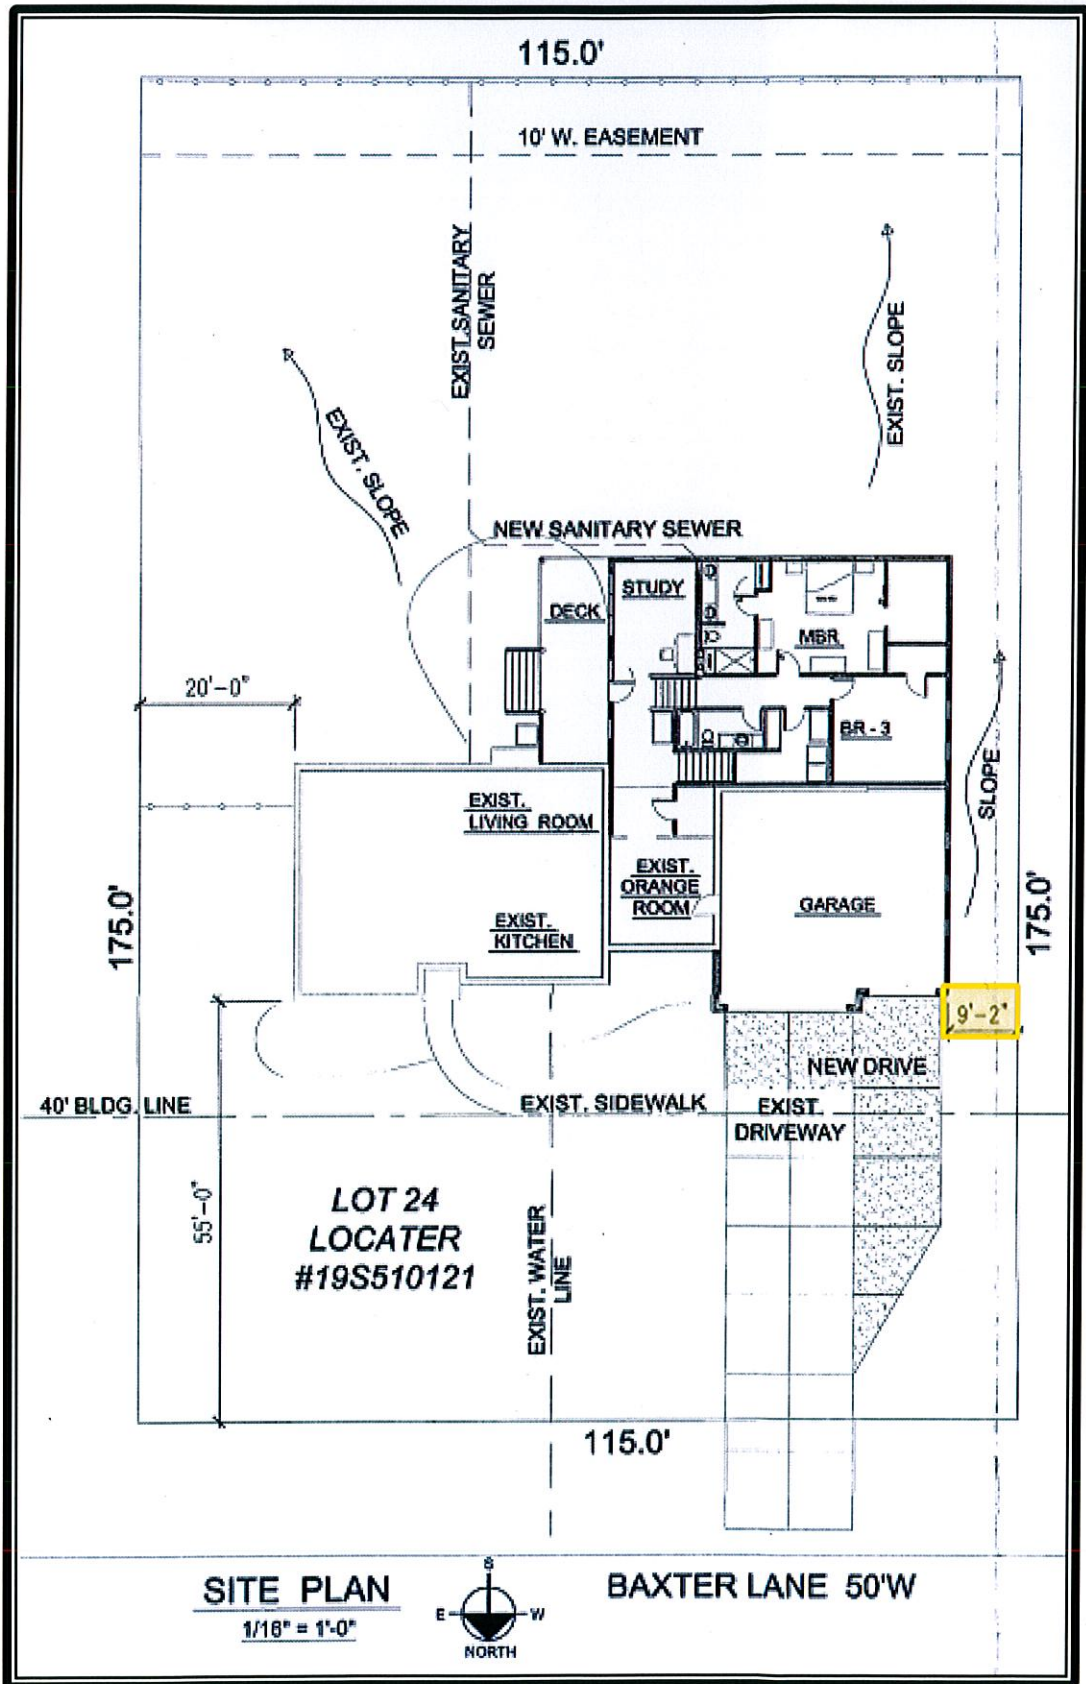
Rejected Site Plan indicating addition encroachment into 20' side yard setback
